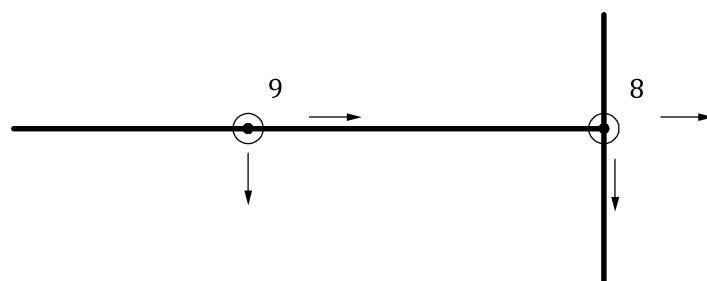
Area-elastic sports floor with elastic construction (beam, consisting of two parallel one upon another battens, support non-staggered)
